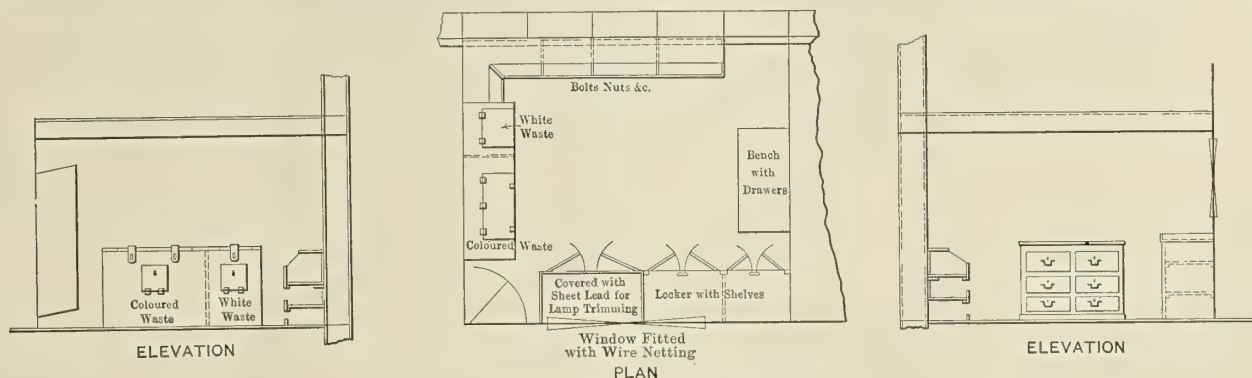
ARRANGEMENT OF ENGINEER'S STOREROOM.
